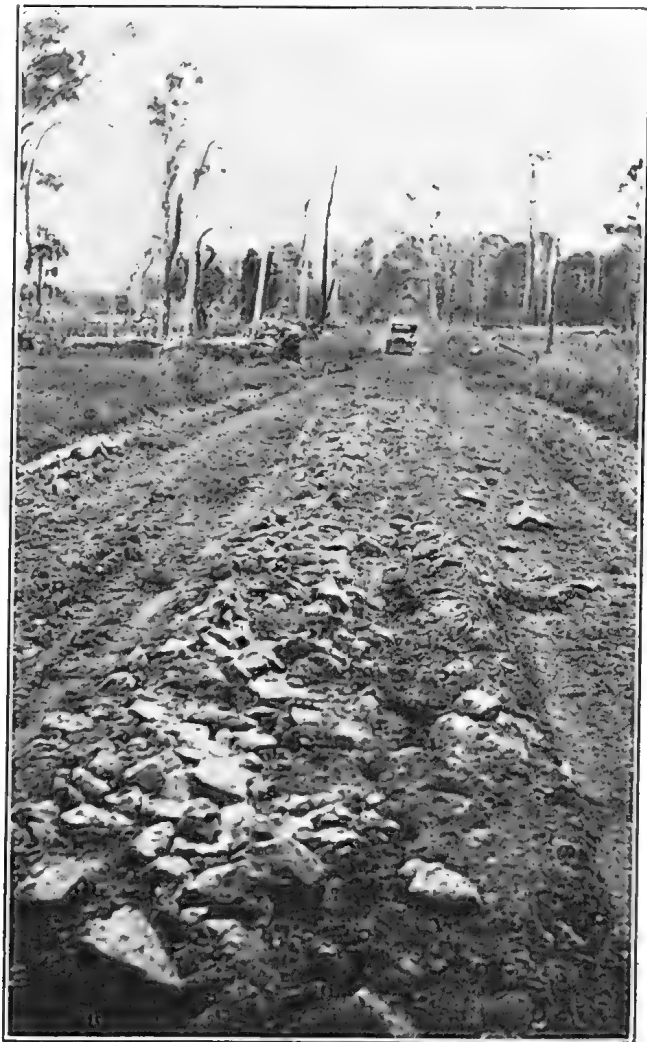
SHOWING ONE METHOD OF ROAD CONSTRUCTION
